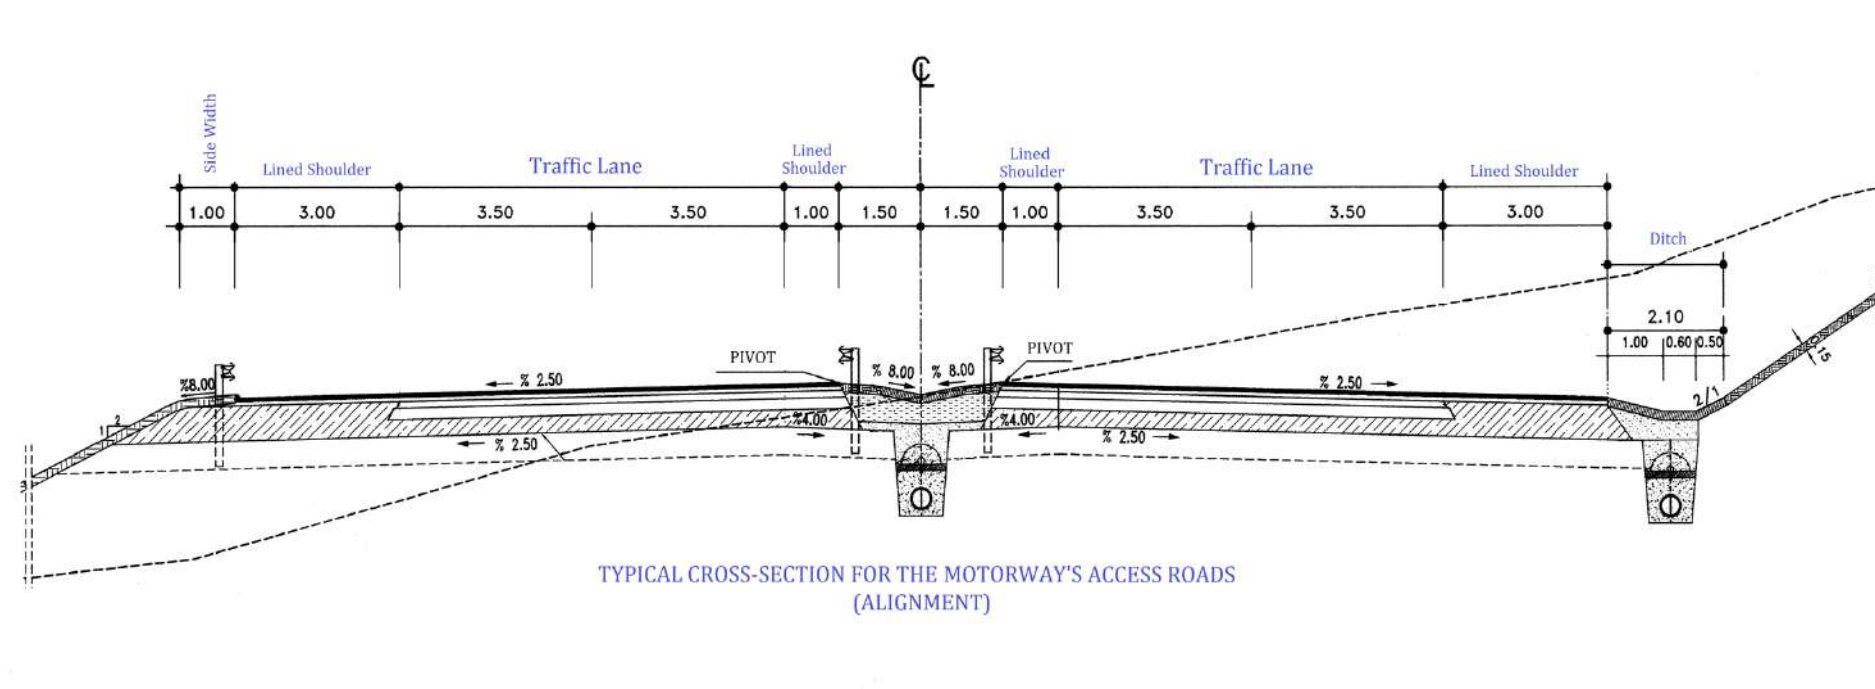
Typical Cross-section for the Motorway's Access Roads
